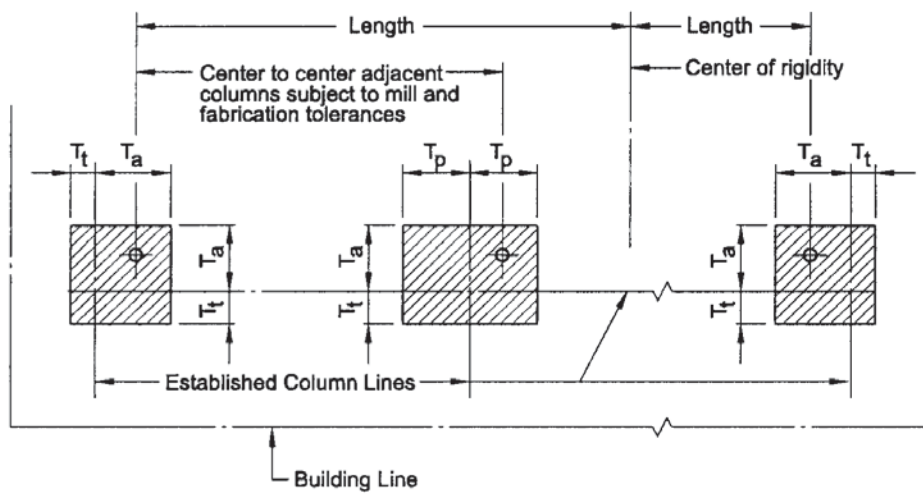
Tolerances in plan location of column (AISC, 2005a).
